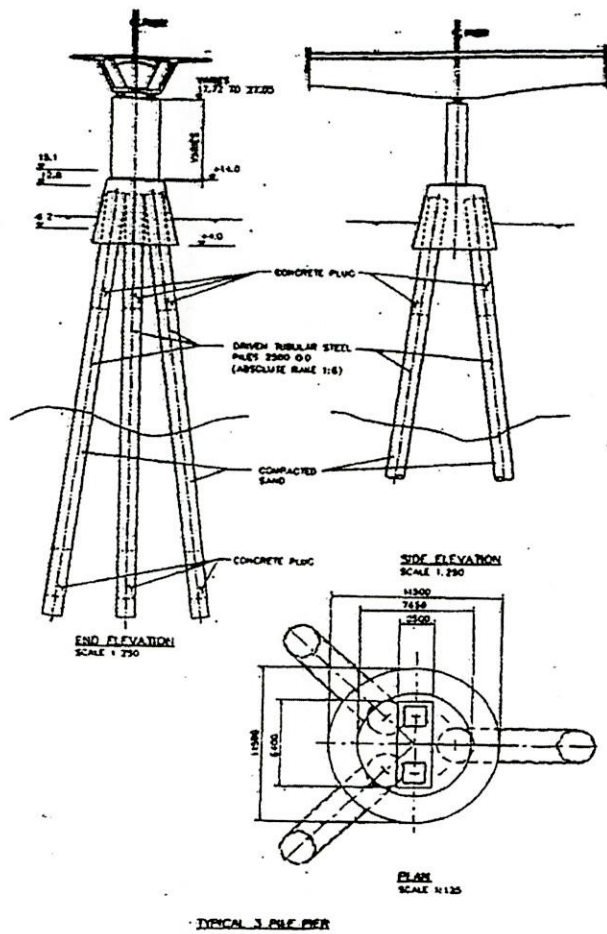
(b) General Arrangement of 3 Piles Pier
